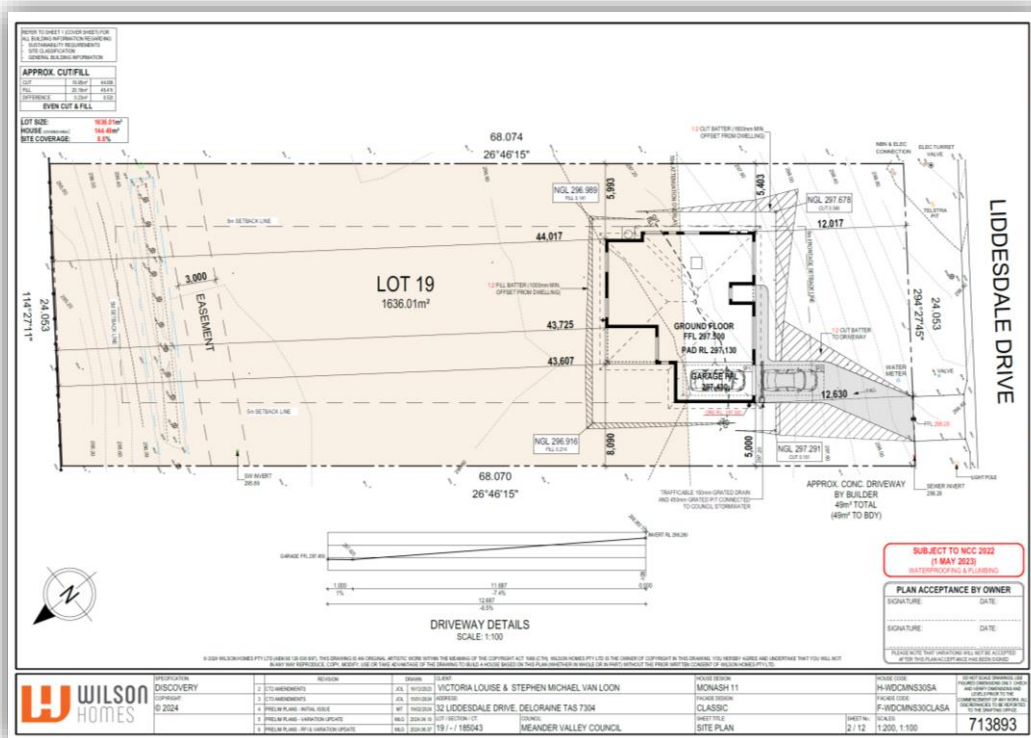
Site plan of proposed dwelling (provided by Wilson Homes).
